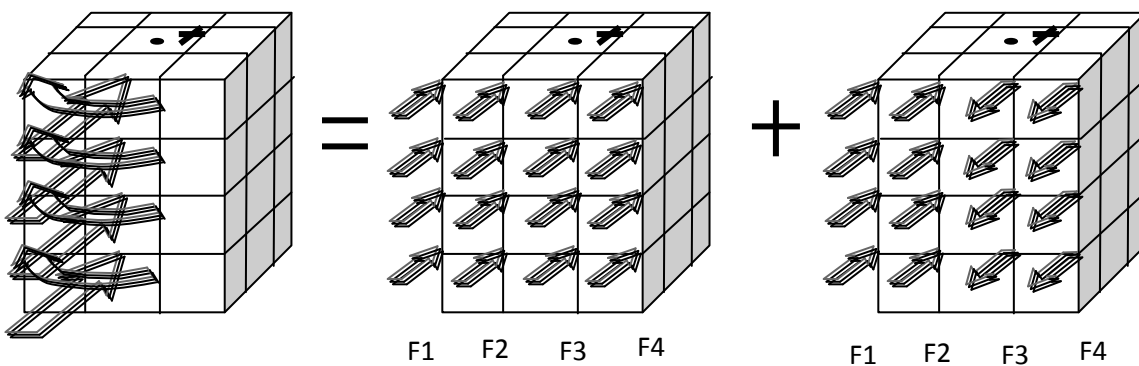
Horizontal Distribution of Inertial and Torsional forces to Individual Frames or Walls
